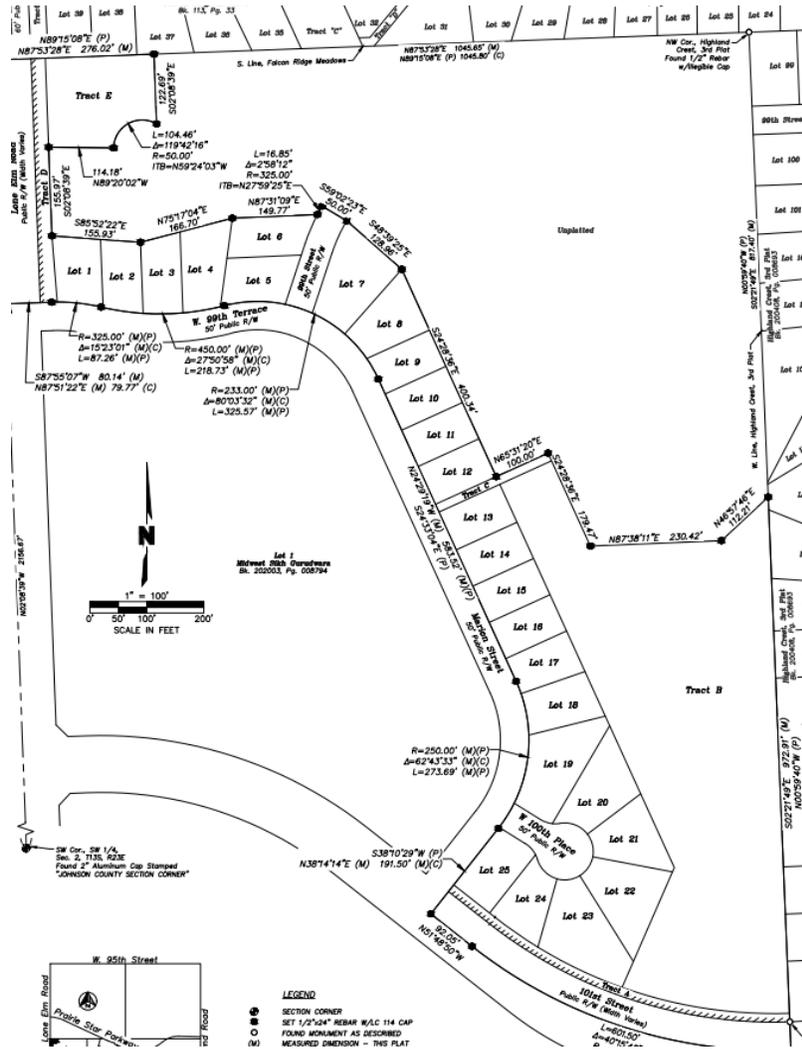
Final Plat of Falcon Farm, 1st Plat
